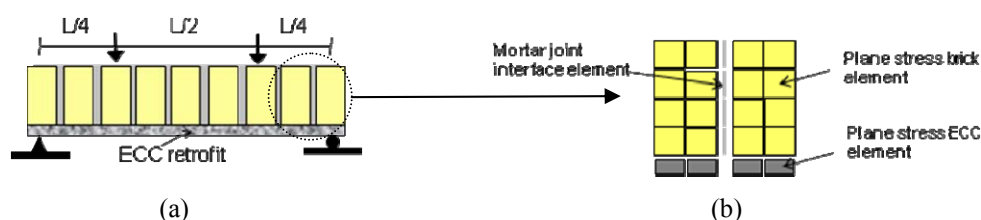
(a) Flexural test set-up of an ECC-retrofitted brick beam, and (b) brick-mortar-ECC finite element modeling approach.
